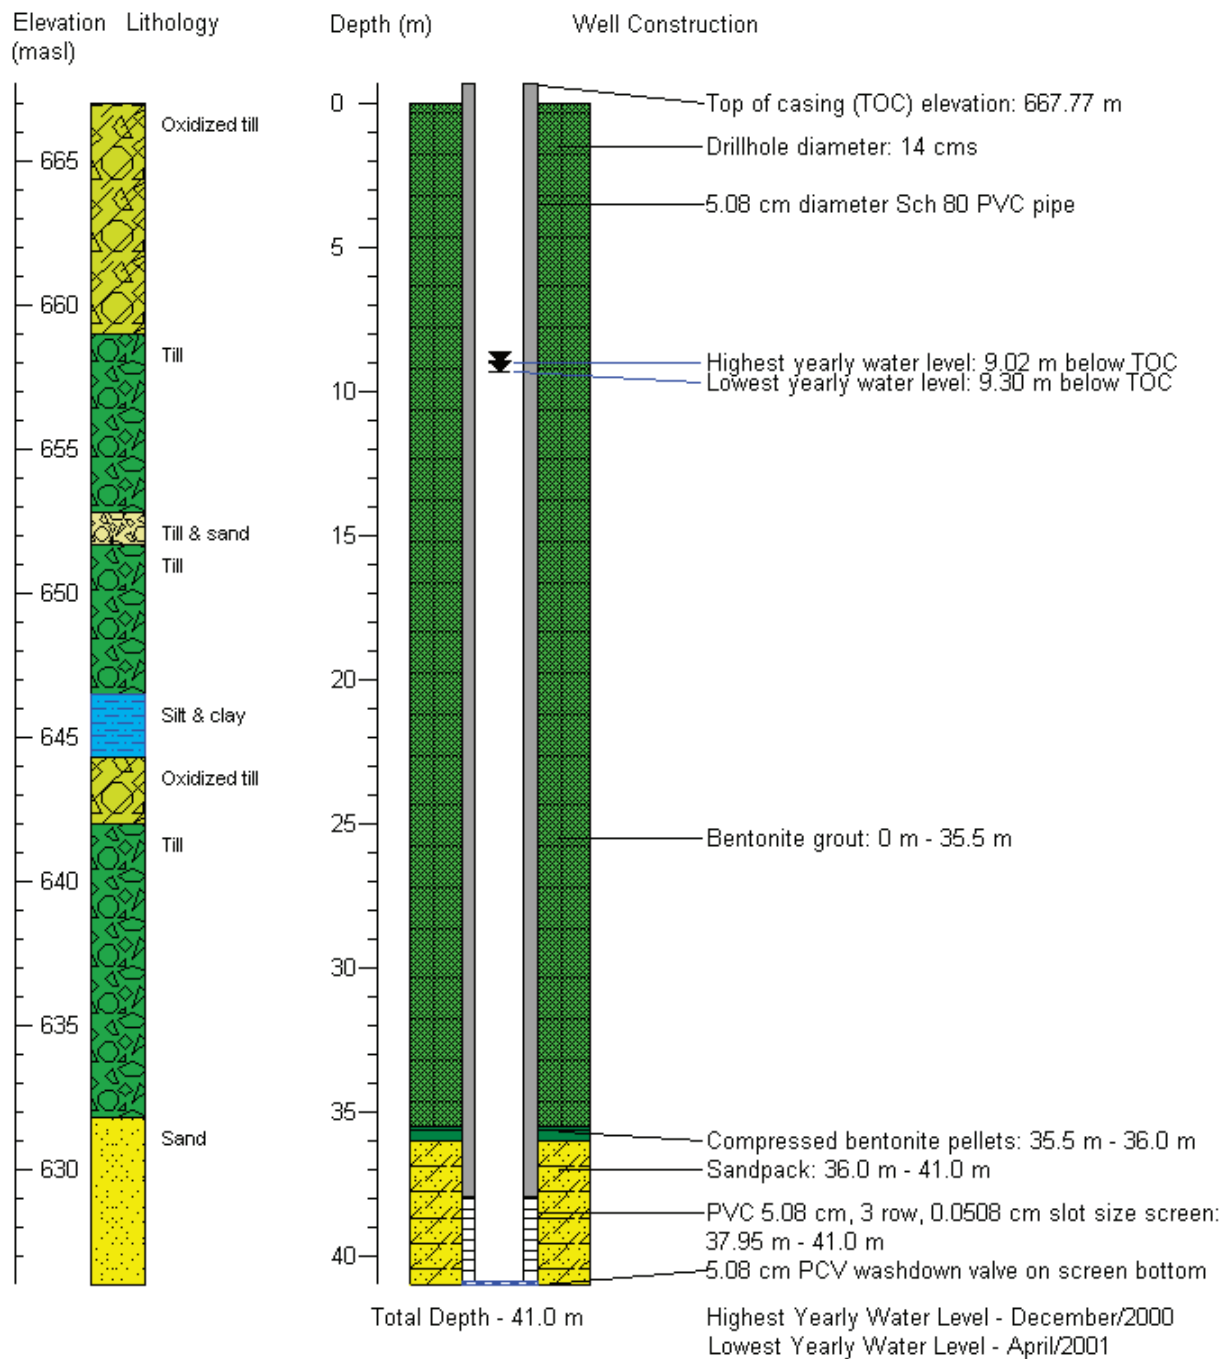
Piezometer construction details: WEPA 00-1-41
